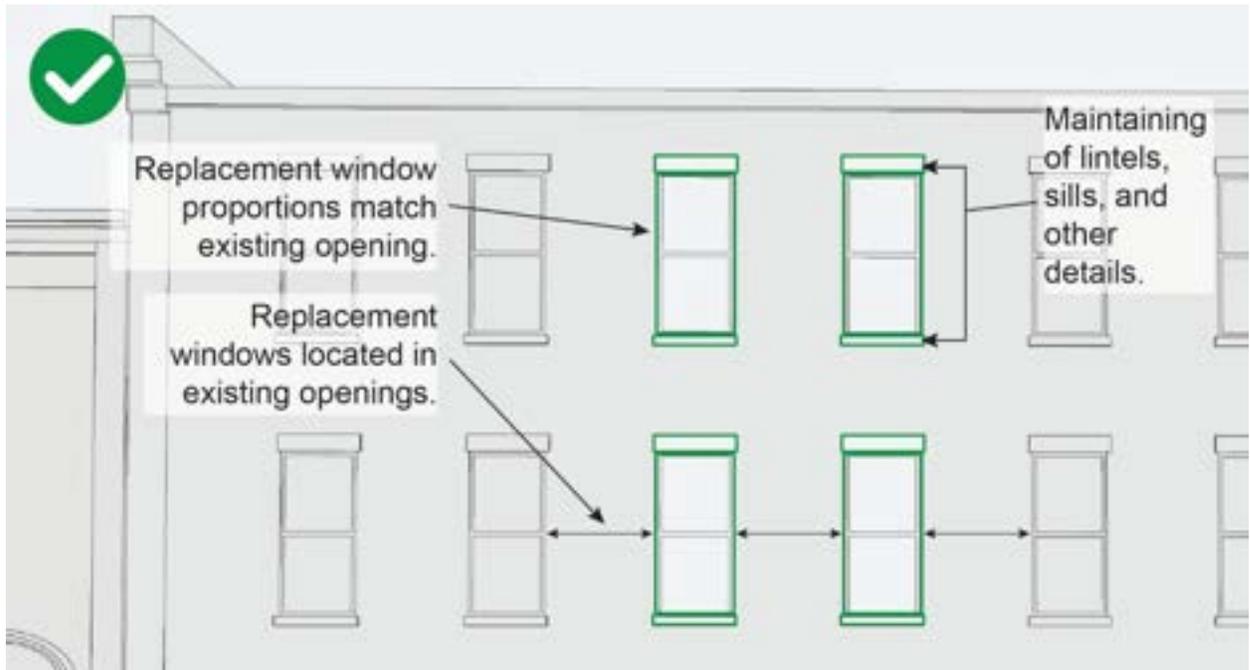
Graphic of compatible window modifications to contributing commercial properties. The opening locations, sizes and architectural details are retained. TRACE
